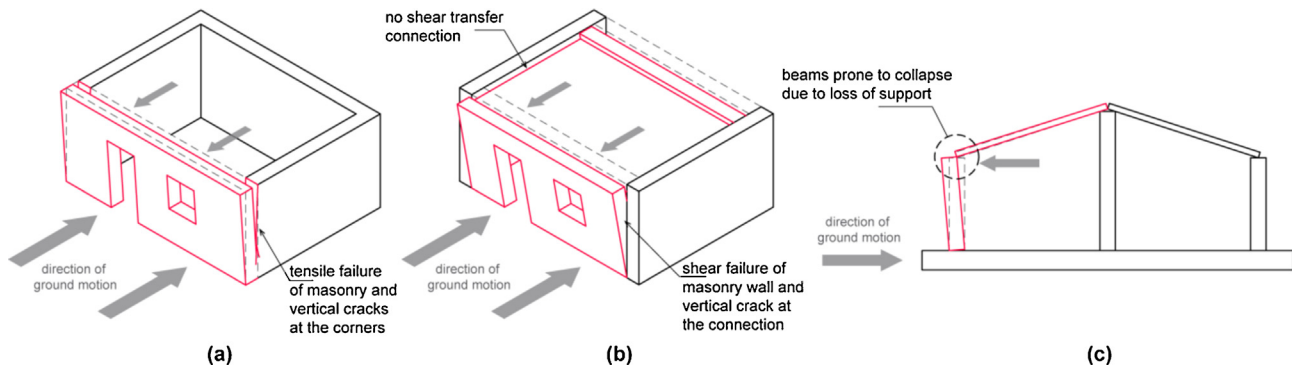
(a) Global overturning of the external walls; (b) lack of anchorage between walls and horizontal diaphragms leading to the toppling of walls; and (c) separation of floors and roofs from the walls.
